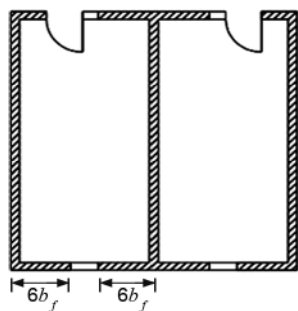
Effective flange lengths on plan view of general URM building (MSJC 2008) [18].
